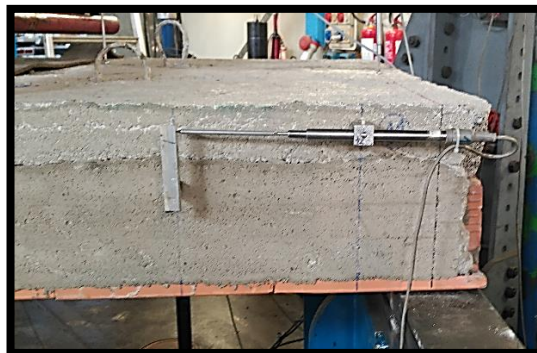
Instrument to measure the delamination between the two floor slab parts. (Source: Laboratory image)
